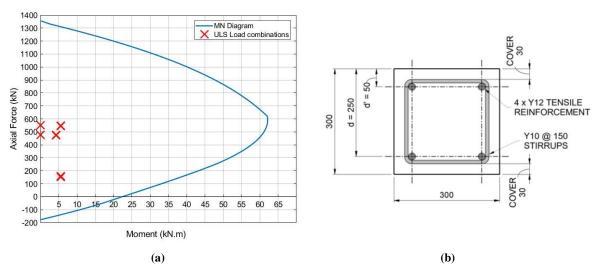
Design of the reinforced concrete column showing (a) the MN-Interaction diagram for the column of the footing at ULS and (b) a section through the reinforced concrete column of the footing
